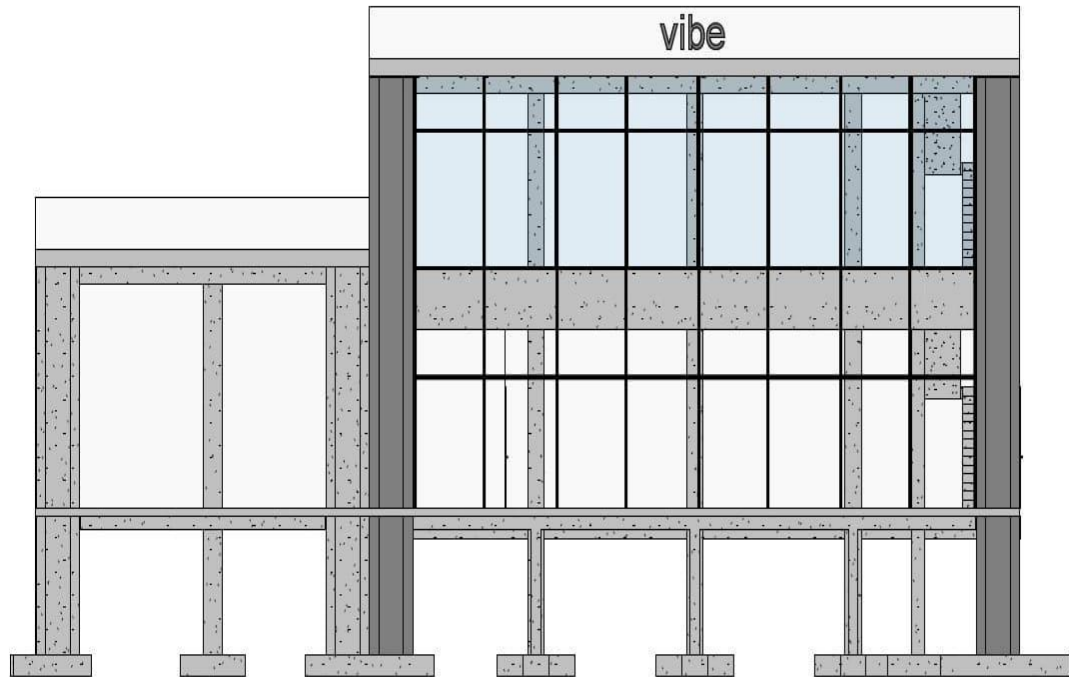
3-D Model of Selected Case Study of Building Project
